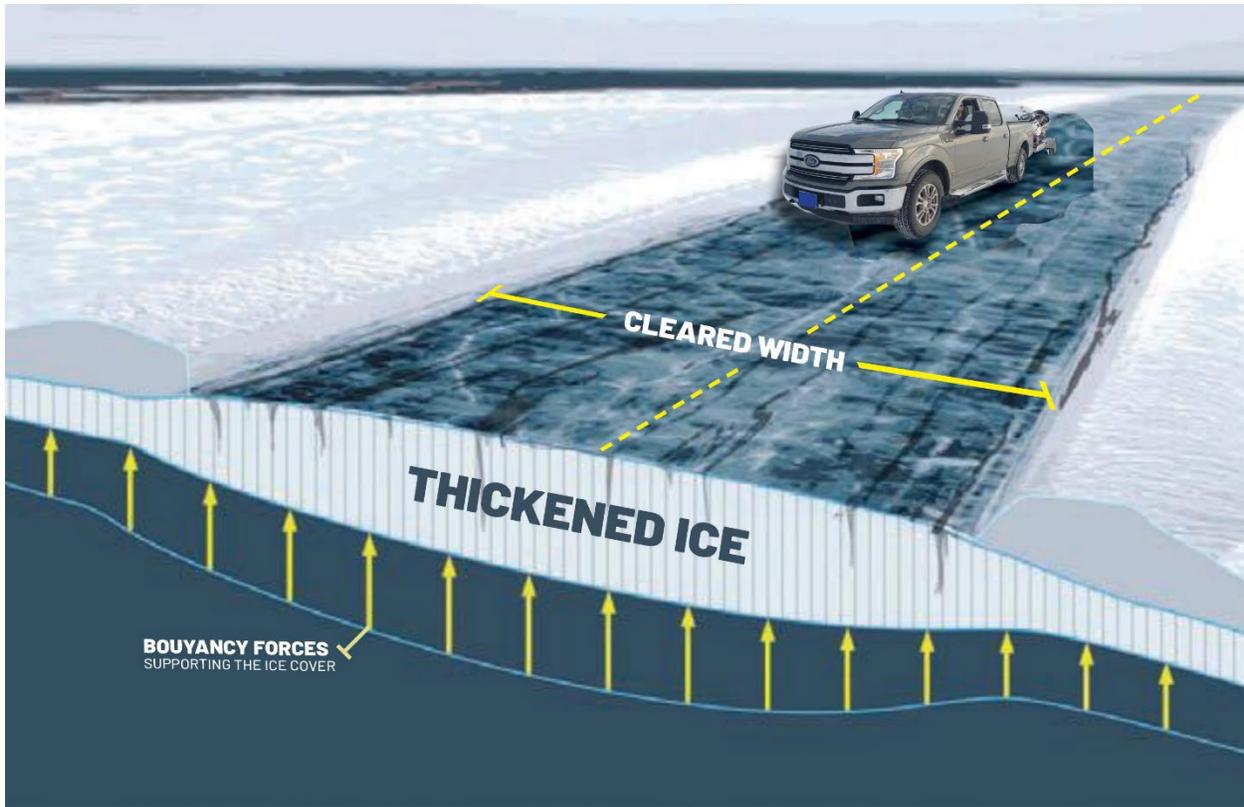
Cross section of ice road (Adapted from Alberta Government 2013)
